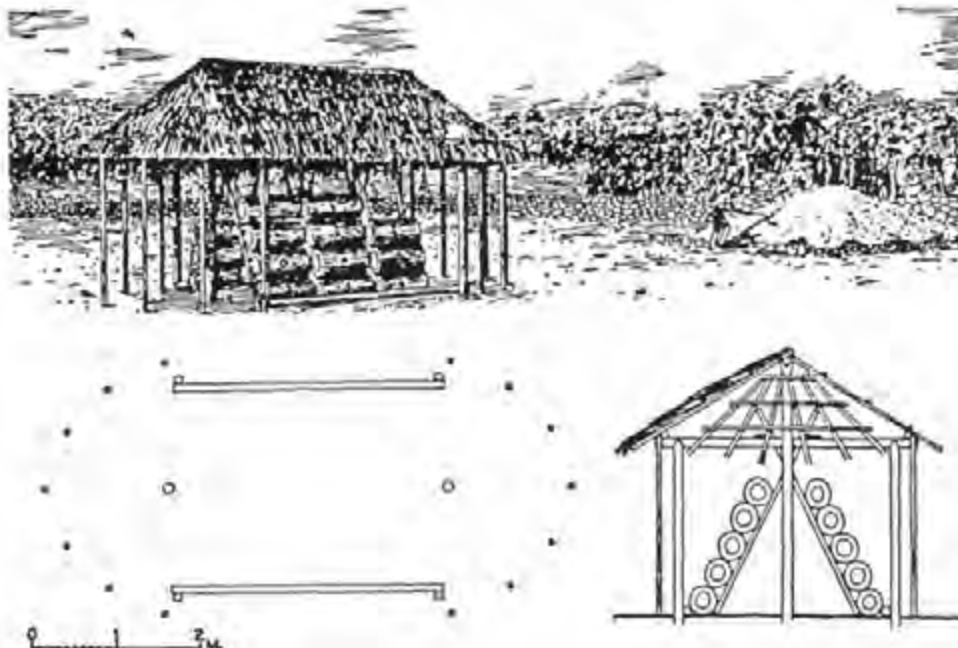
A-rack with log hives under a thatched shelter, Yucatan, 1920s (Wauchope, 1938). Drawing of shelter, plan and elevation.
